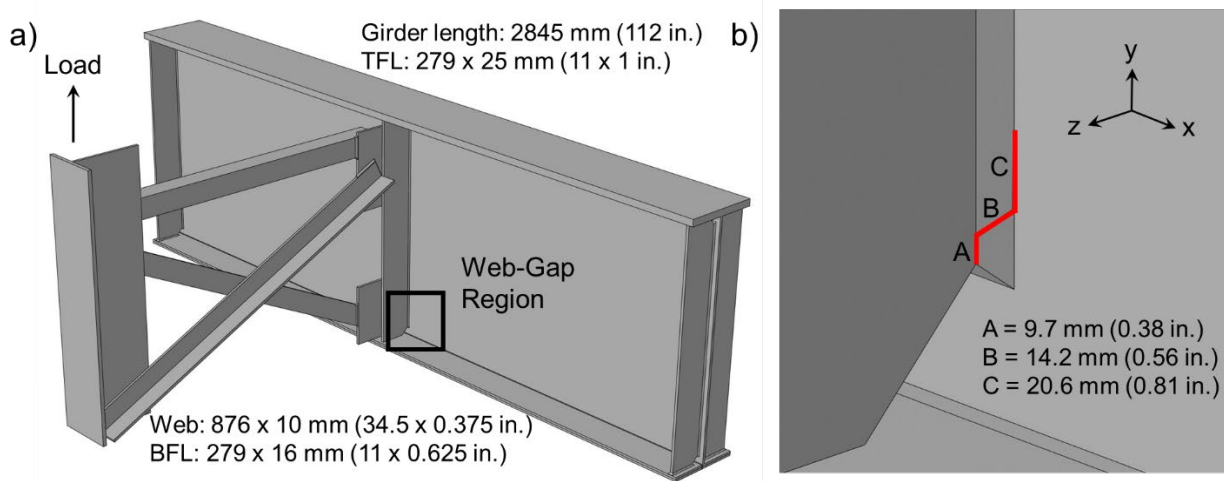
a) Out-of-plane girder subassembly and b) Crack location and geometry
